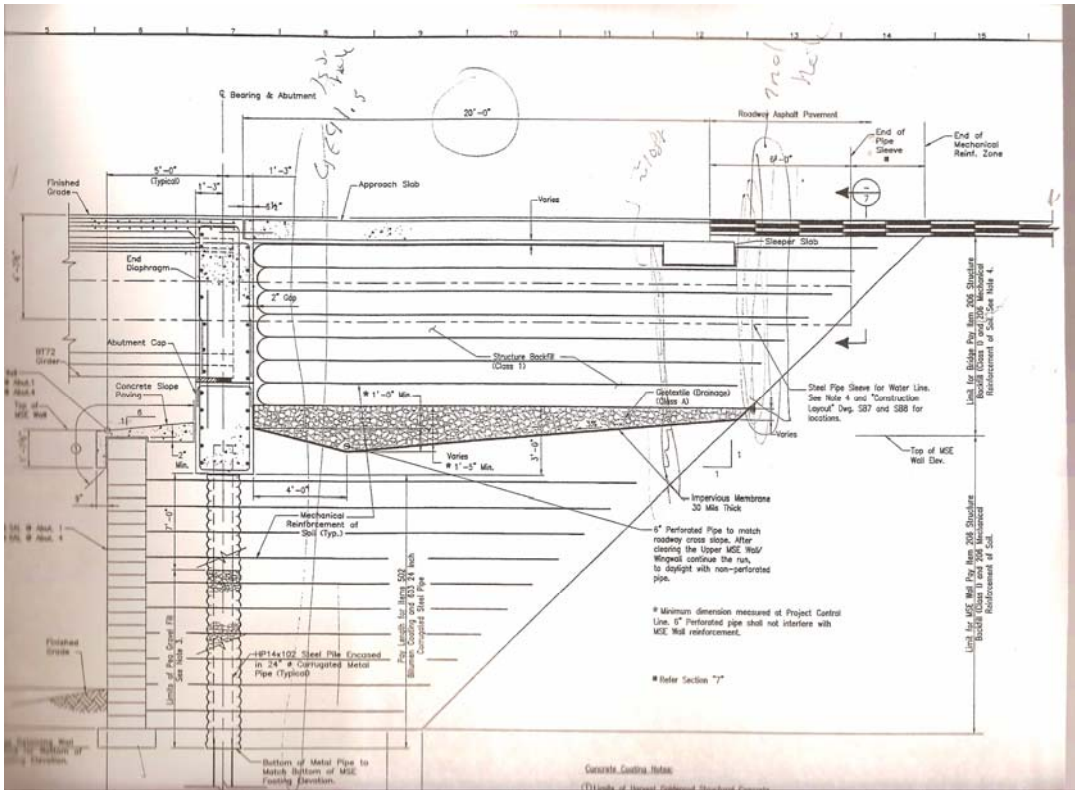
A Section along the Front MSE Wall of the Salt Creek Bridge.
